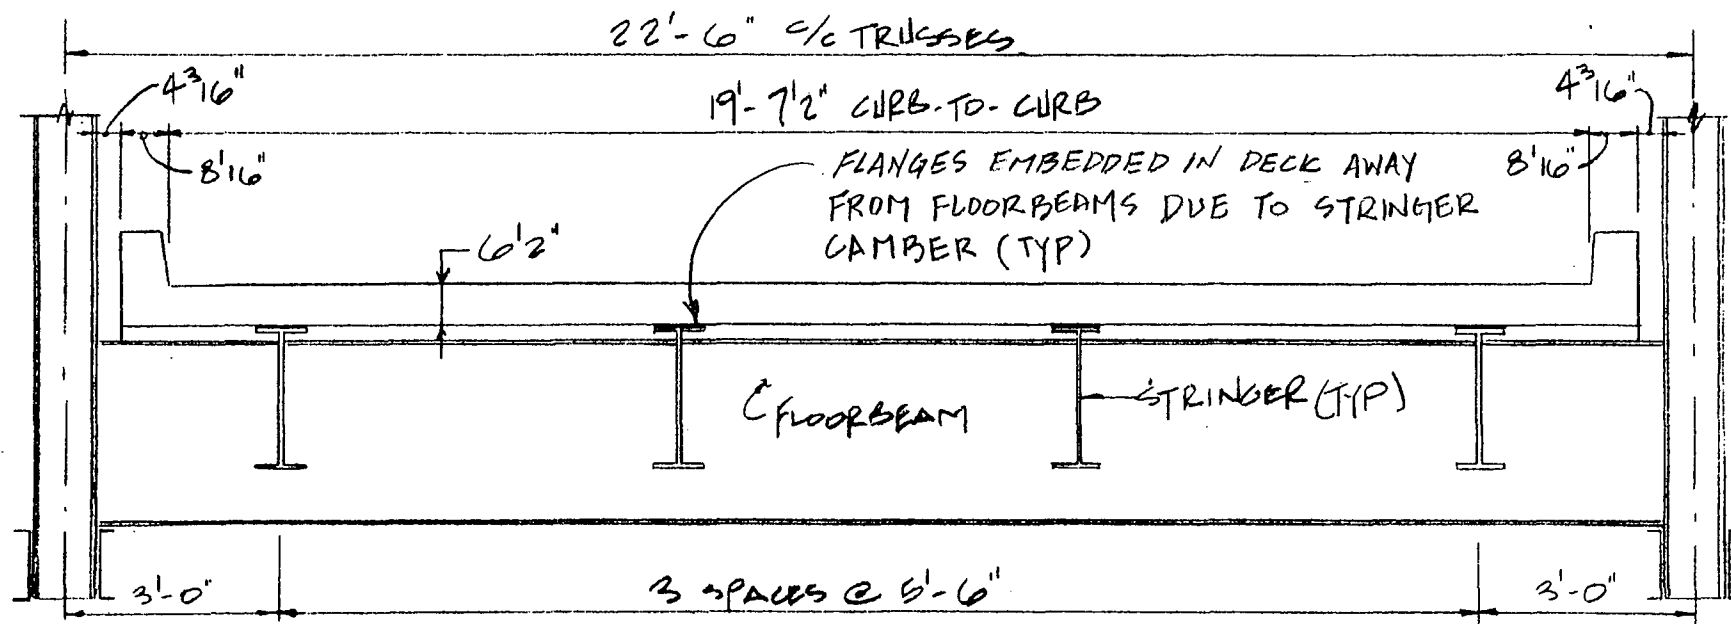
Typical Cross Section Through Truss Floor System for St. Clair County Structure No. 004-58-021.9
